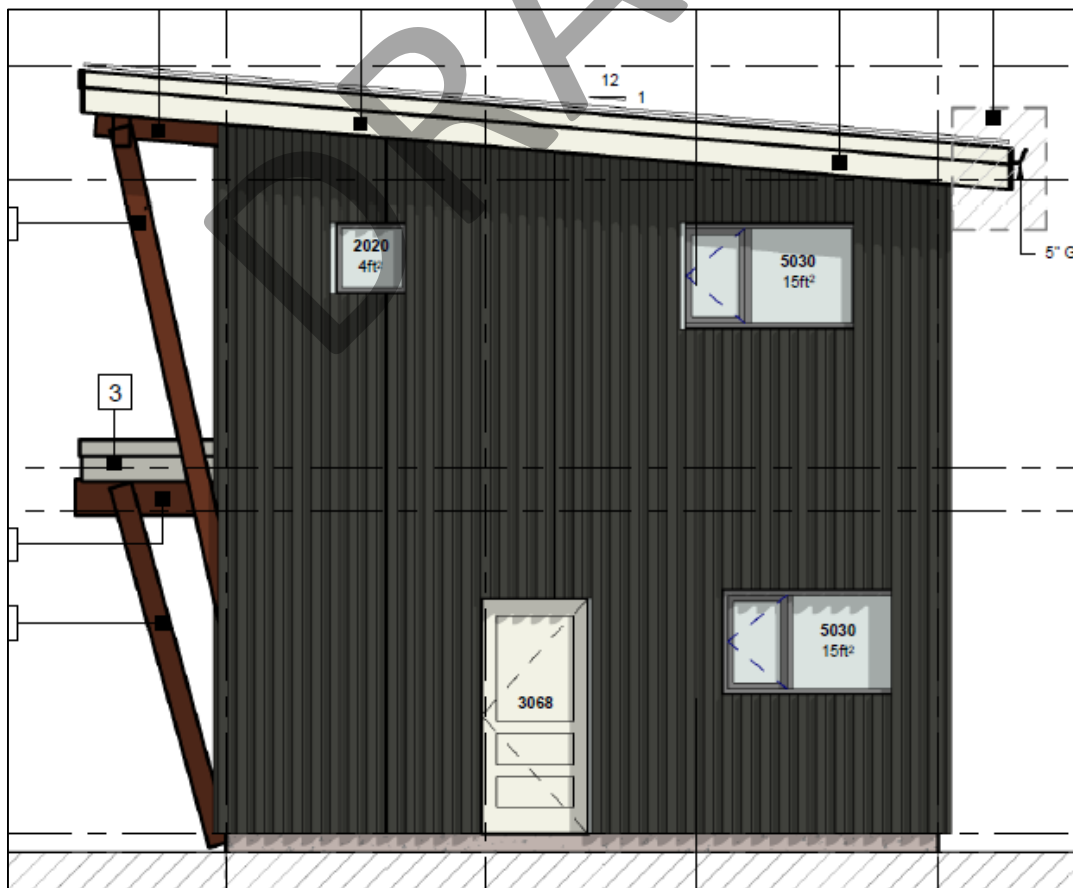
North Elevation (Facing Existing House at 596 Eckhardt Ave)
